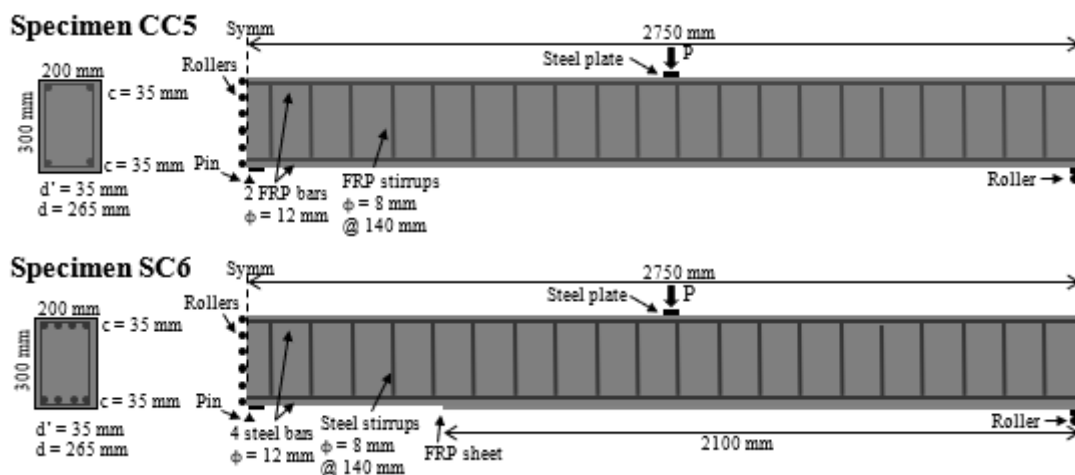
Geometry boundary conditions and reinforcement details of the beam models.
